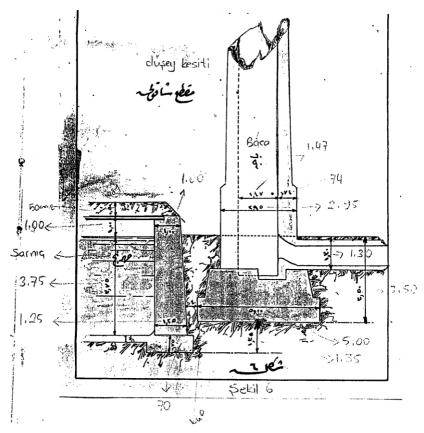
20. Original drawing of steam chimney of Cendere Water Pump Station
